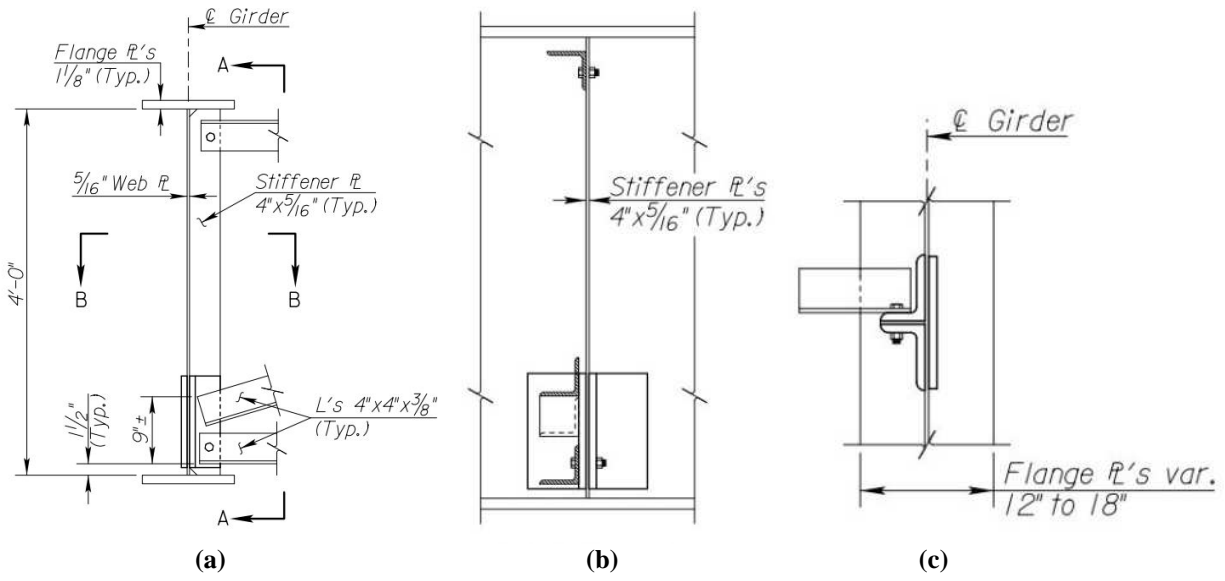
Proposed retrofit elevation from KDOT (a) Side view (b) Section A-A (c) Section B-B.
